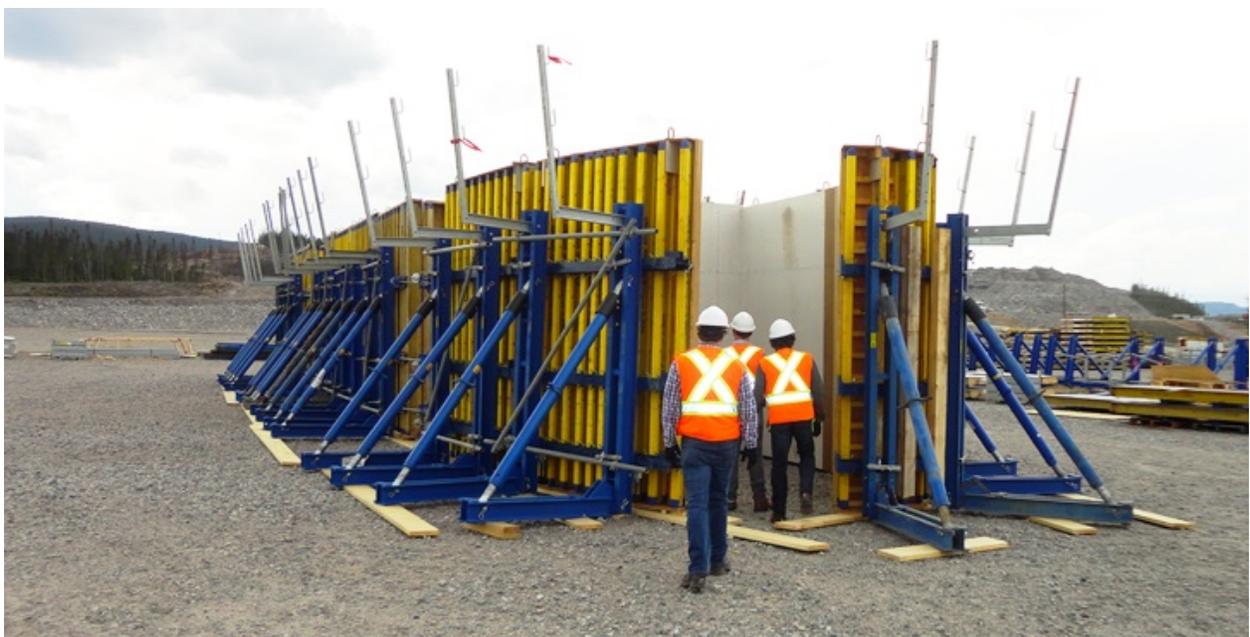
Trial assembly of tailrace pier formwork. (July 17, 2014)
